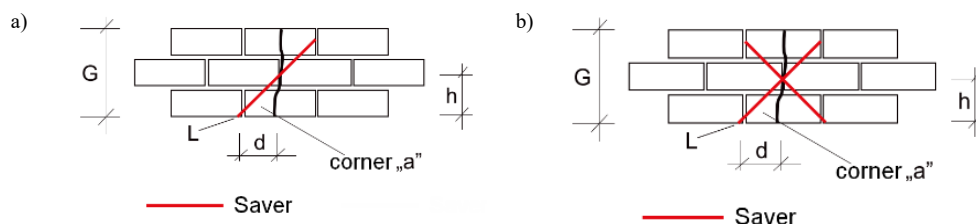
Installation diagram of anchors and cross anchors in a wall of thickness G
